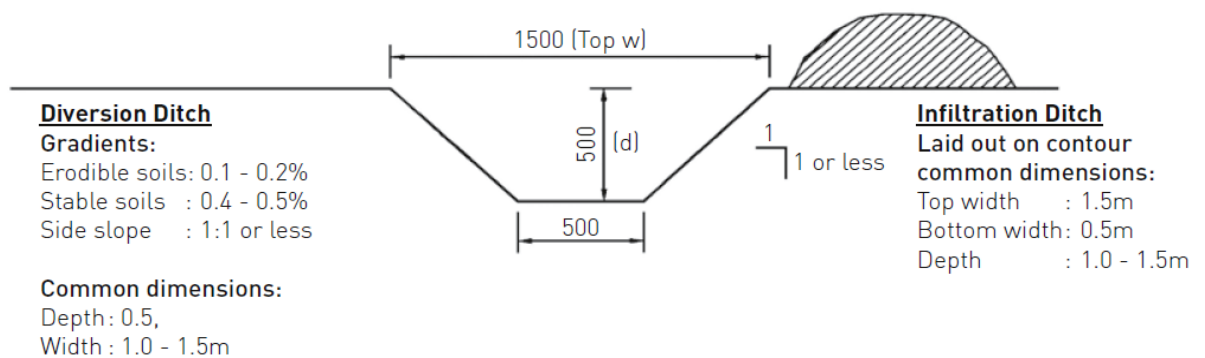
Dimensions for trapezoidal sections of diversion ditch/cut-off drain and infiltration ditch (Source: Guideline for prevention and control of soil erosion in rock work, 2010)
